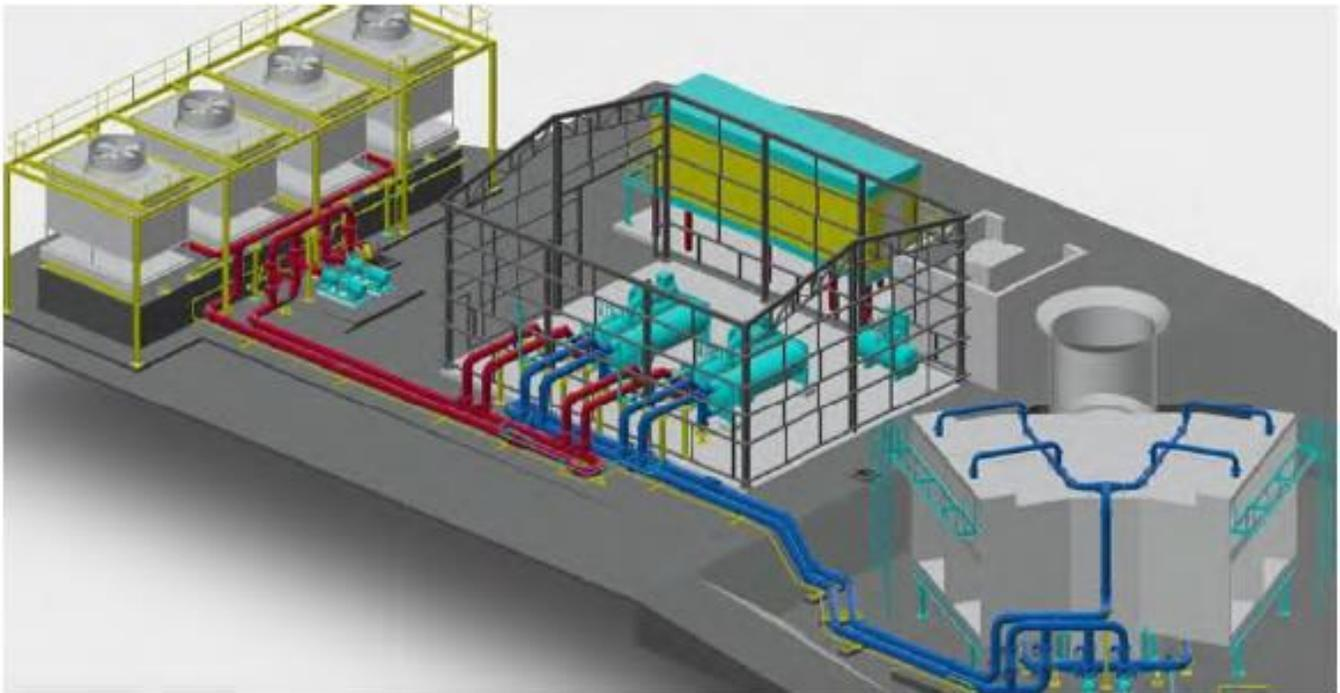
3D Rendering of Refrigeration Plant 2 Design
